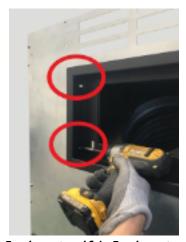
Trapdoor external fixing Trapdoor external fixing
